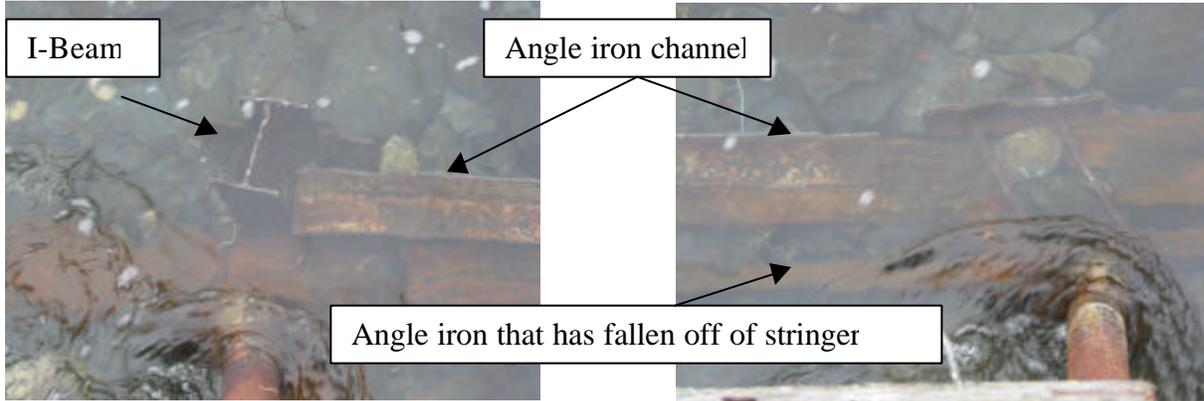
Pictures of angle iron used to hold the bottom of the weir panels, Frazer Lake, 2001.
